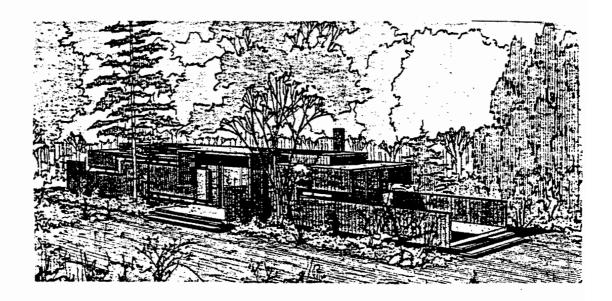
UNIT DESIGN: SITE PLANNING AS A DETERMINANT
